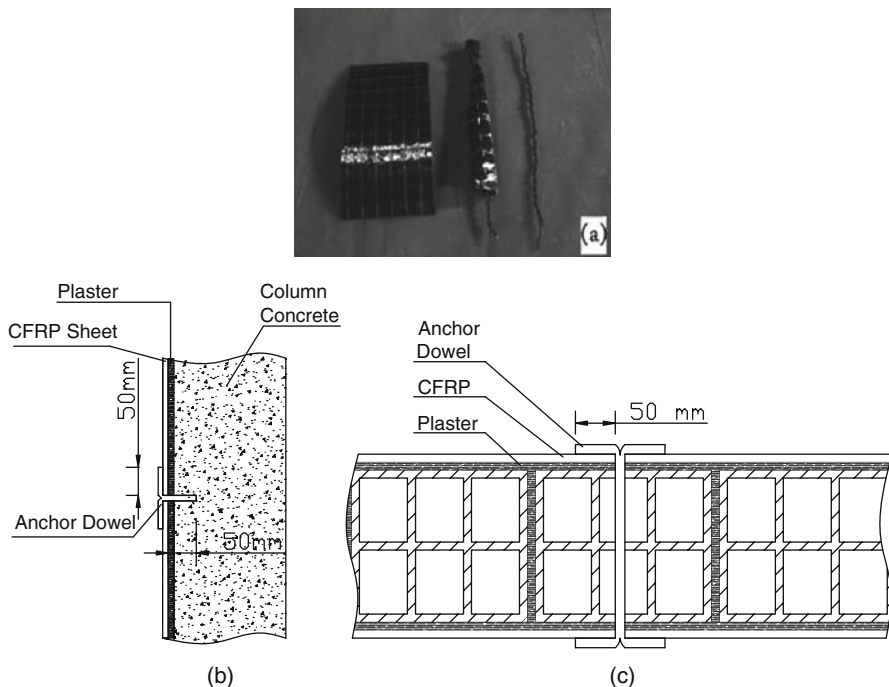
(a) Made-up anchor dowels and application of the anchor dowels to (b) the frame members and (c) the masonry walls
